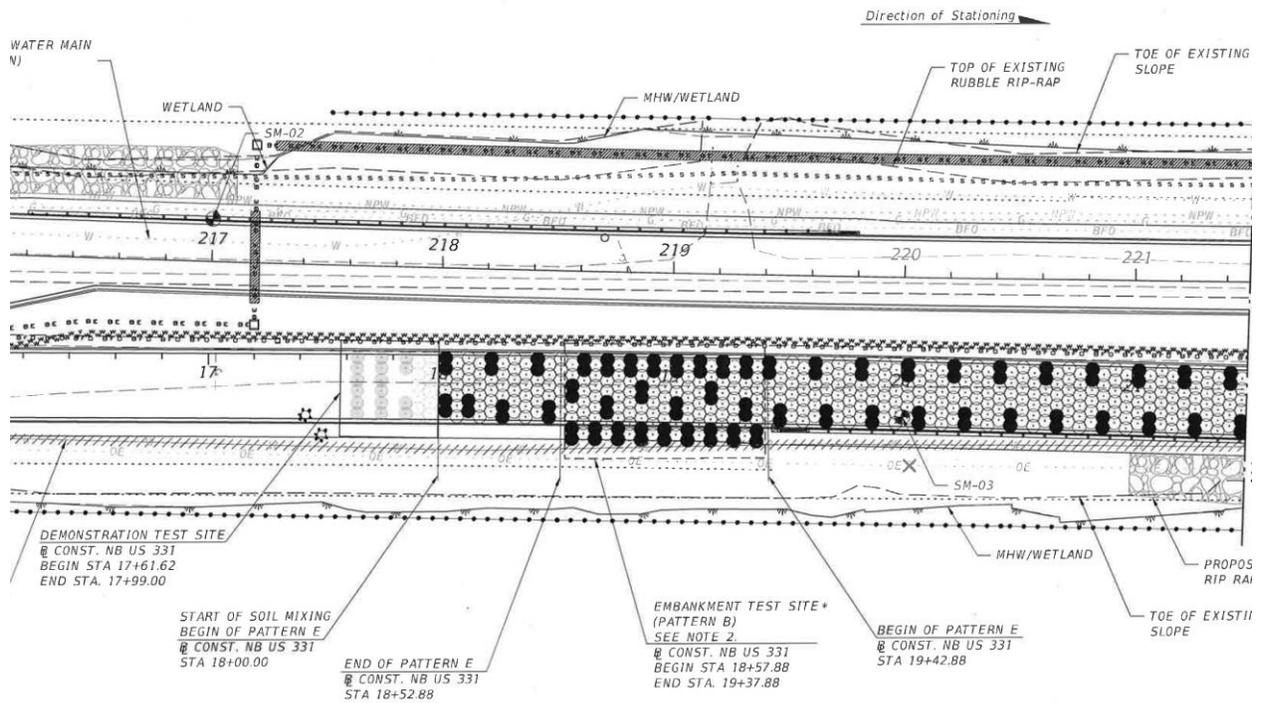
Plan view of south causeway treatment layout and test section (FGE, 2014).
